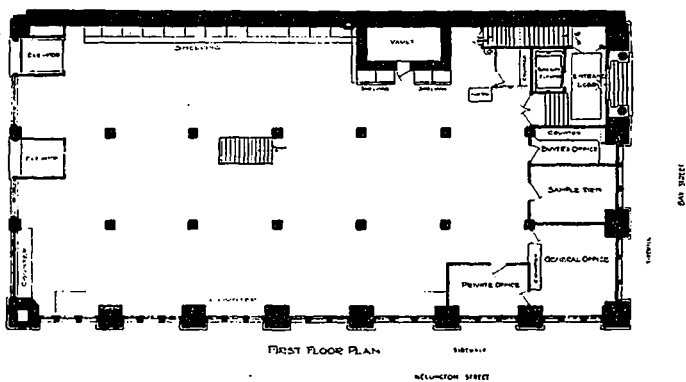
FIRST FLOOR PLAN, OGILVIE BUILDING, TORONTO, SHOWING ARRANGEMENT AND LOCATION OF THE STEEL COLUMNS, FIREPROOFED WITH CONCRETE.
